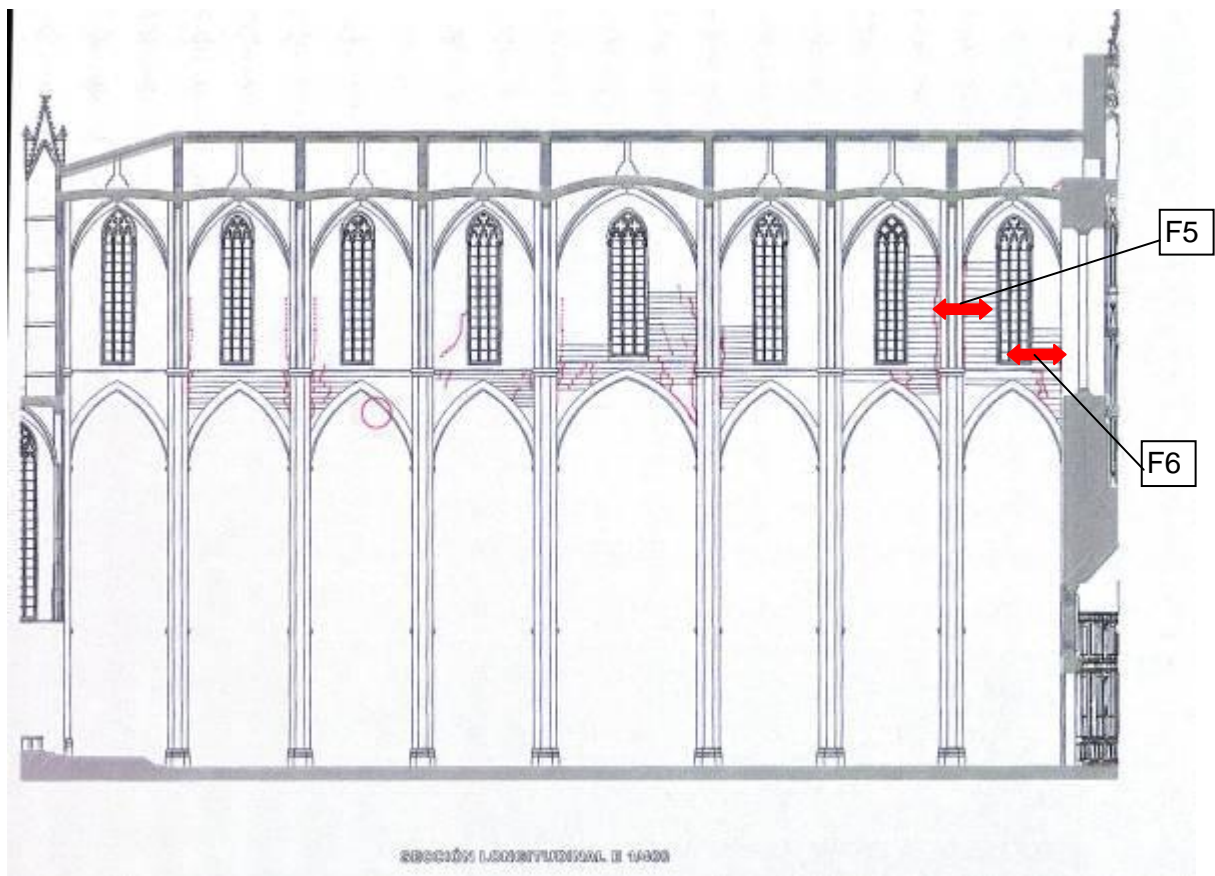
Monitoring of cracks in clerestory wall (Roca, 2004)
